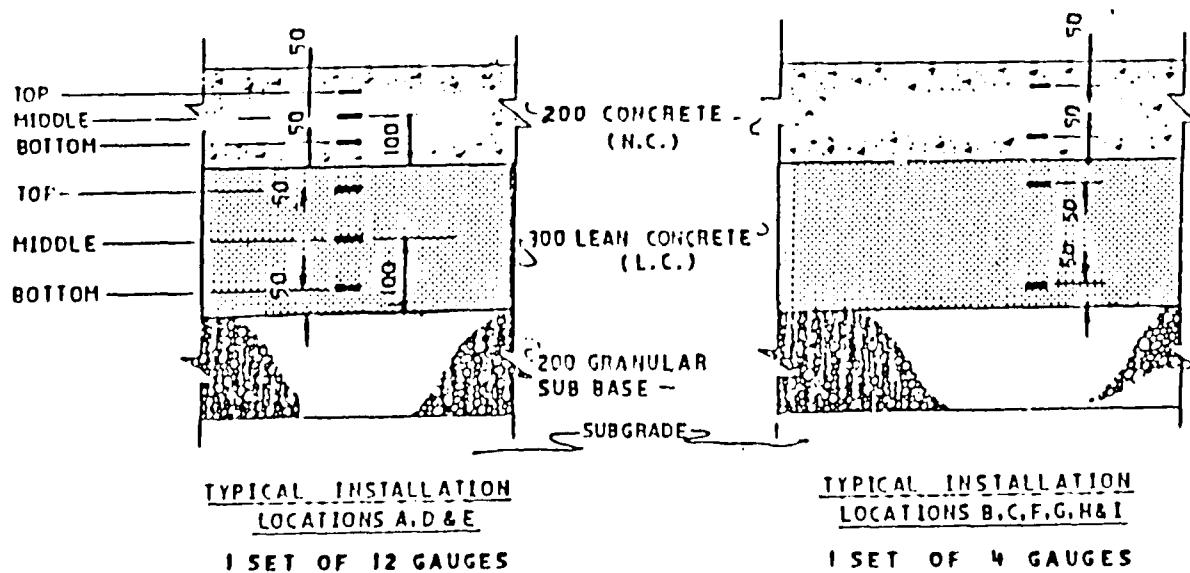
Arrangement of strain gages in the pavement at Brandon
